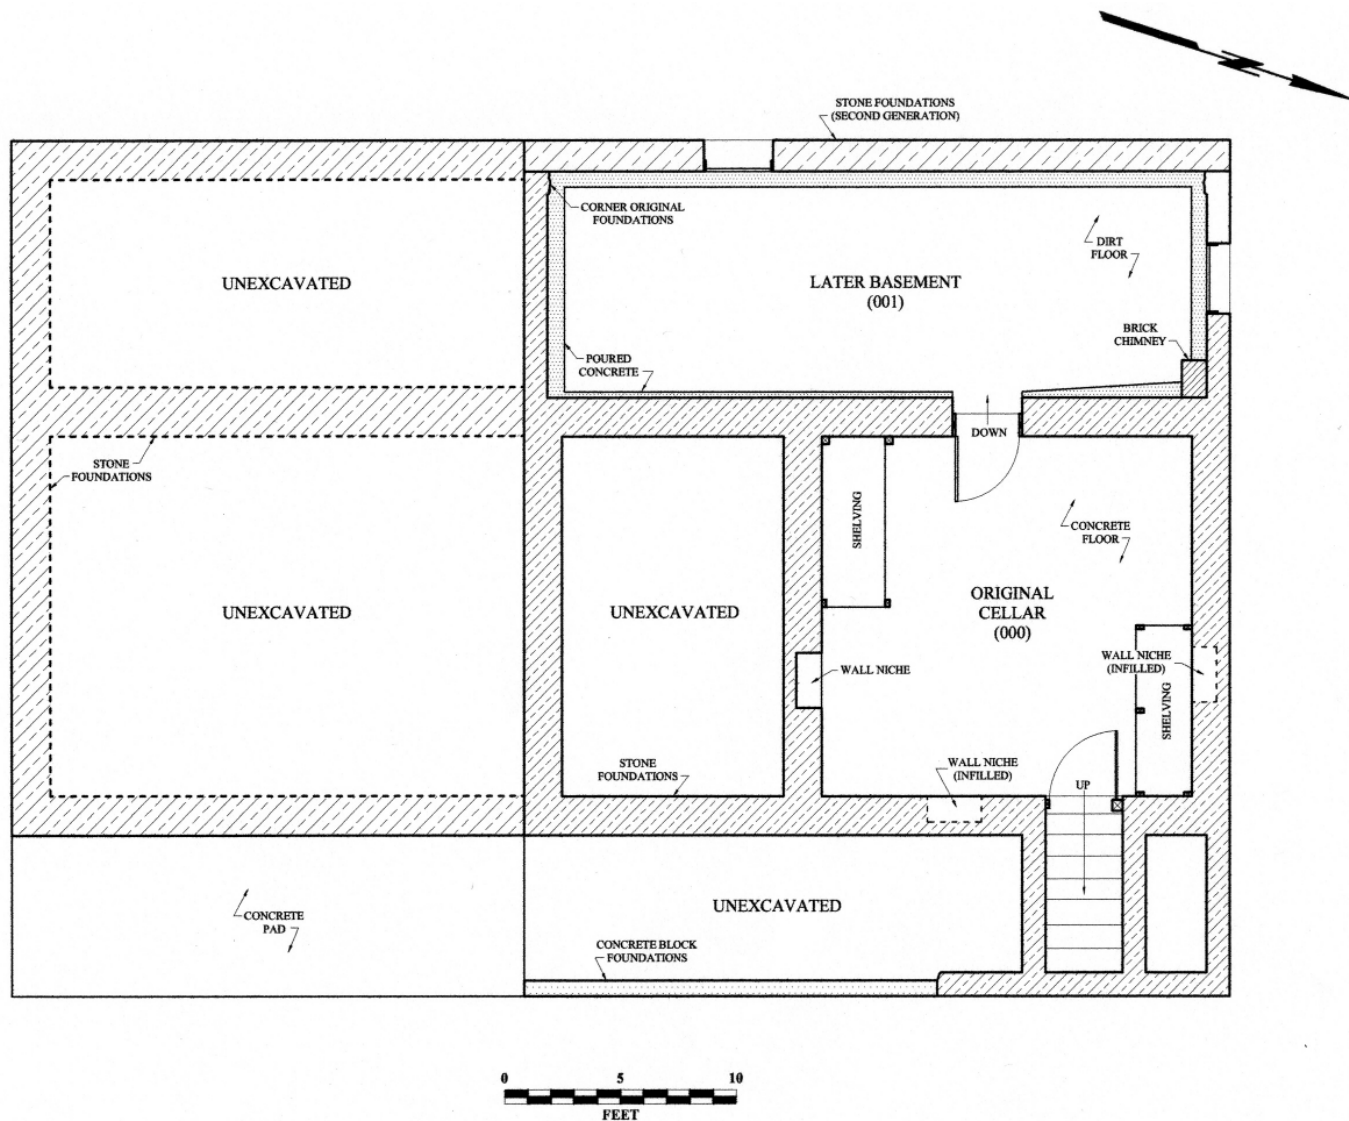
Basement plan of the house showing existing conditions. Room 000 represents the original cellar. A new basement room (001) was excavated circa 1940.
